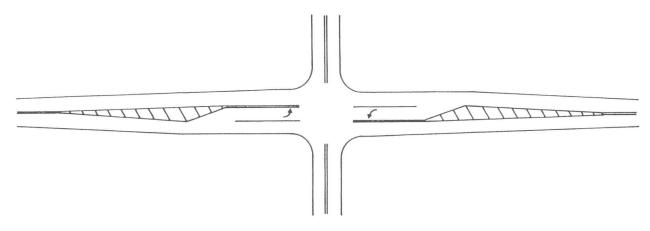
Plan View of Typical Intersection with Left-Turn Lanes
